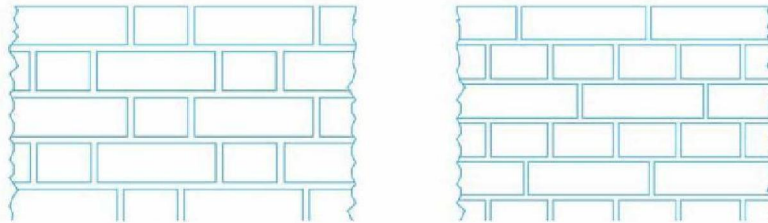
Bond patterns suggests solid wall construction (headers visible).
